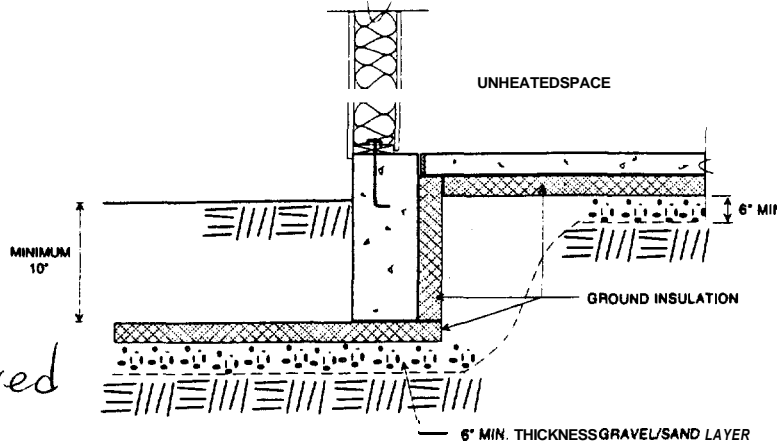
FPSF Design for Unheated Space with independent Slab and Stem Wall.
